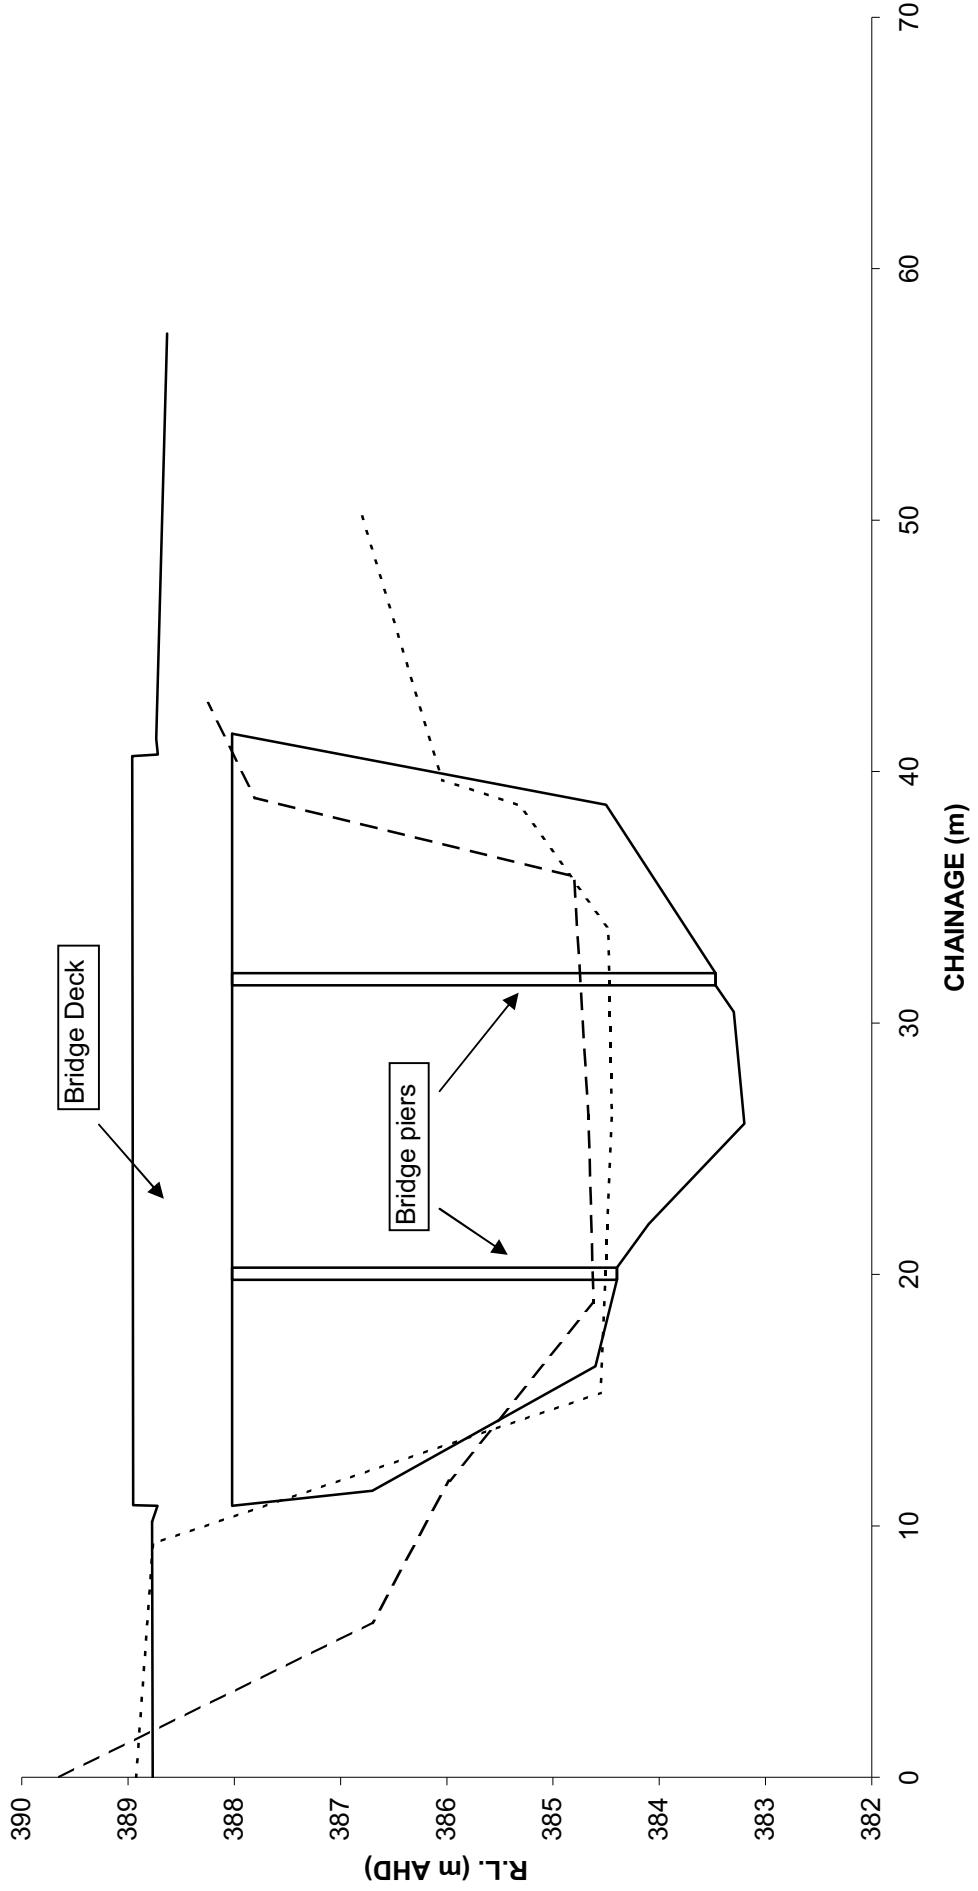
DETAILS OF BRIDGE CROSSINGS OF MOOLARBEN
